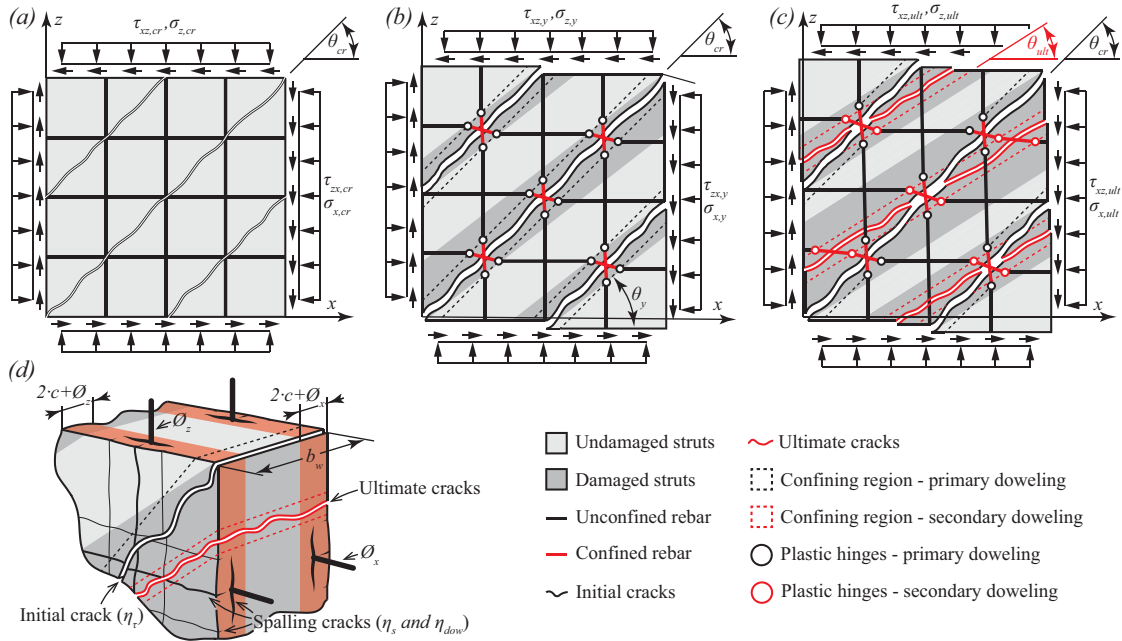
Modelling the physical behaviour of a reinforced concrete panel subjected to shear and axial loads: (a) cracking point; (b) onset of yielding; (c) failure of the panel and (d) in-plane and out-of-plane reduction mechanism of concrete compressive strength
